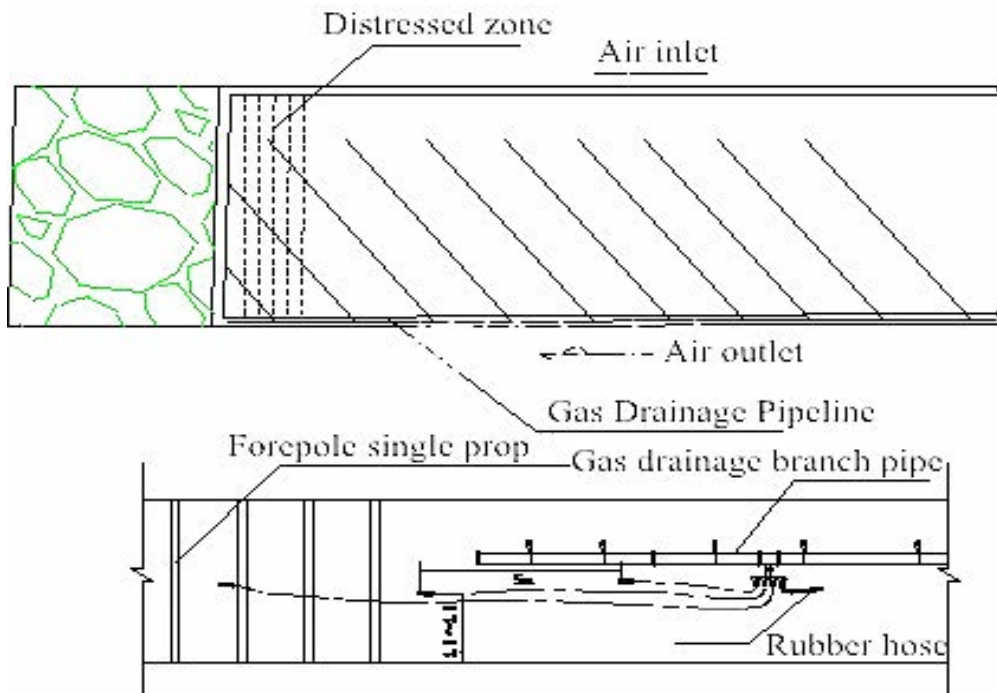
Layout of gas drainage borehole in the coal mining working face
